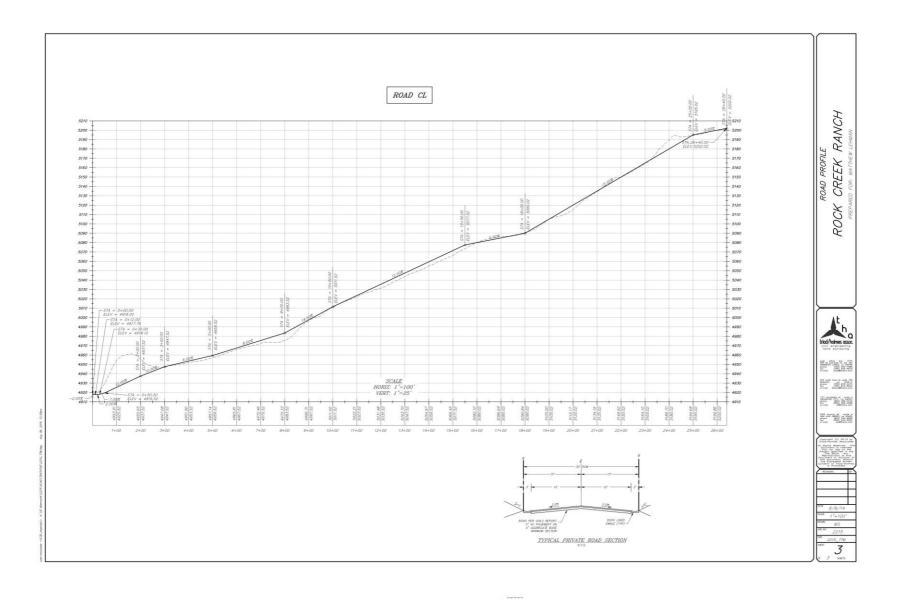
INTERNAL ACCESS ROAD PROFILE
